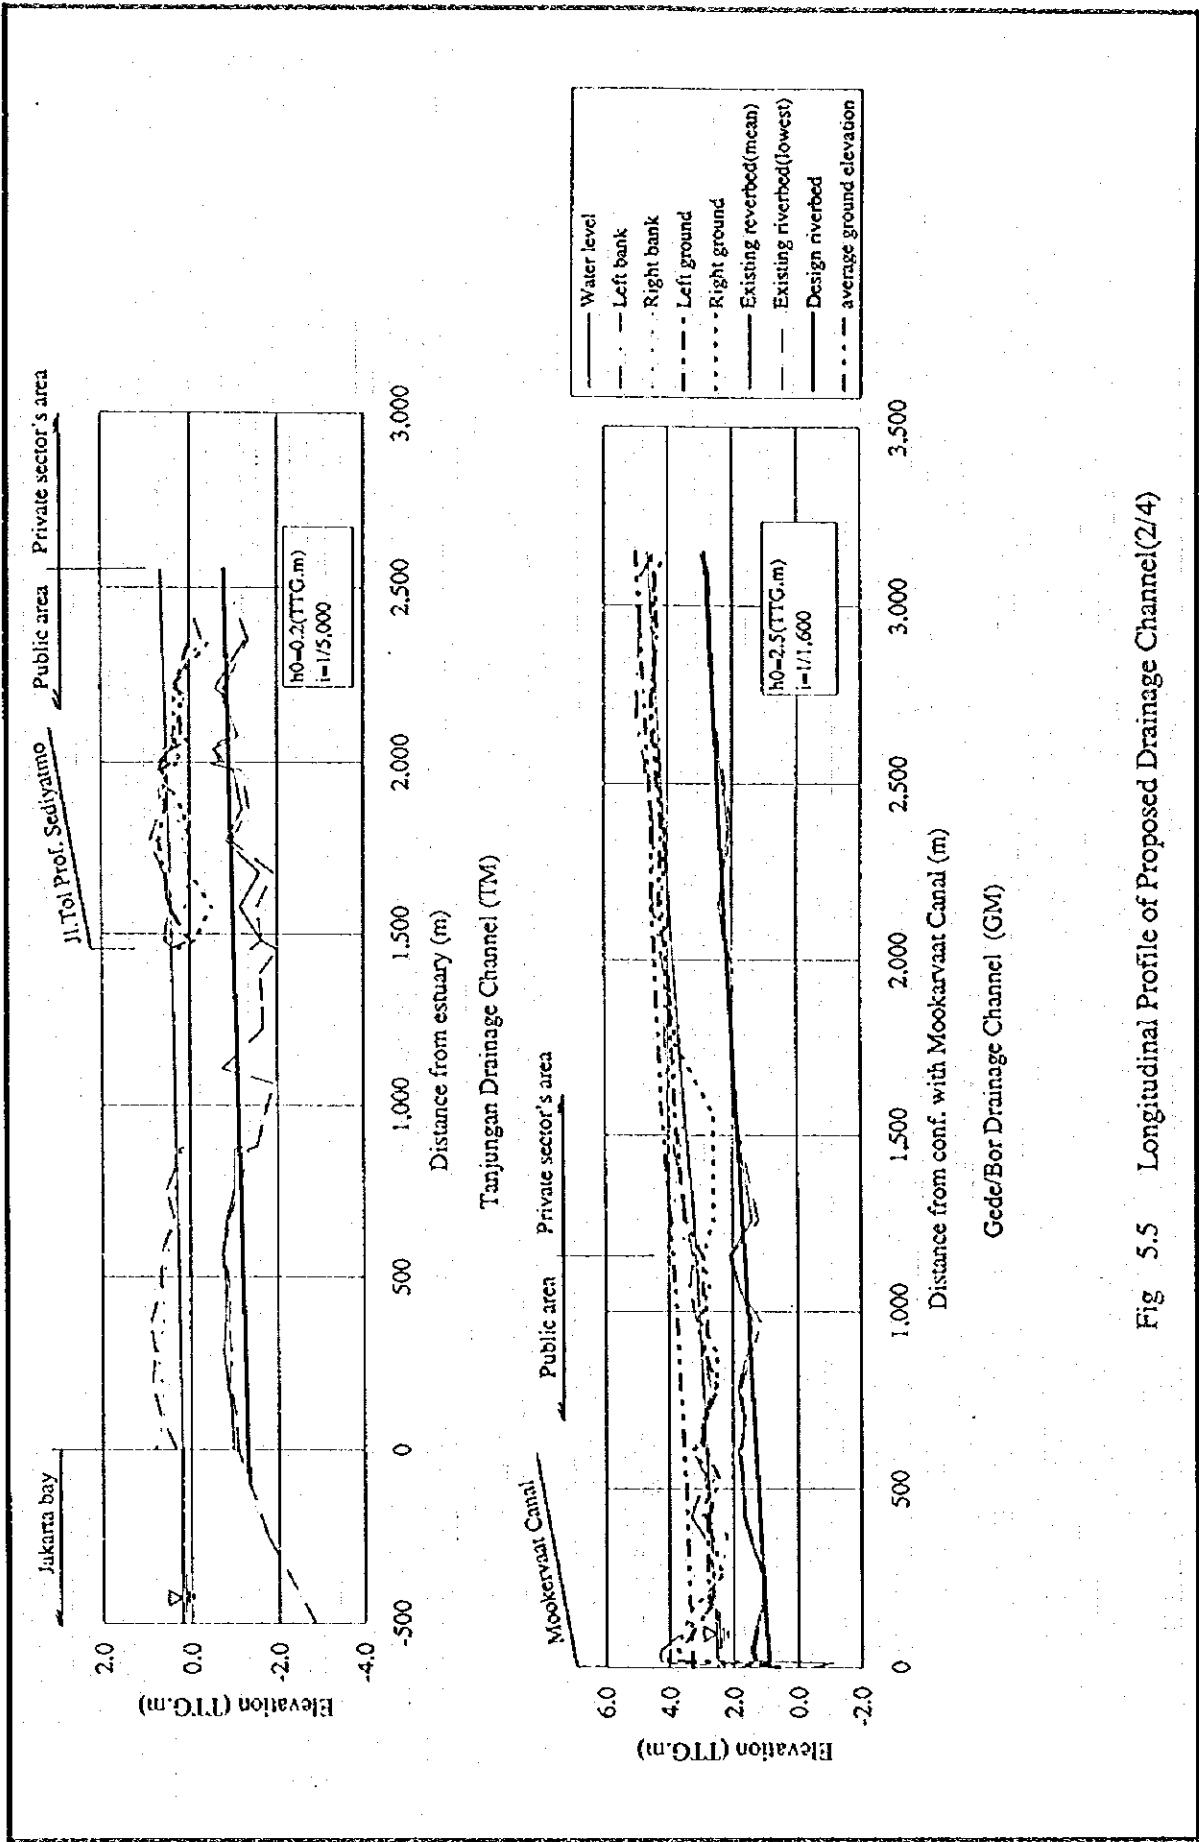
Longitudinal Profile of Proposed Drainage Channel(2/4)
